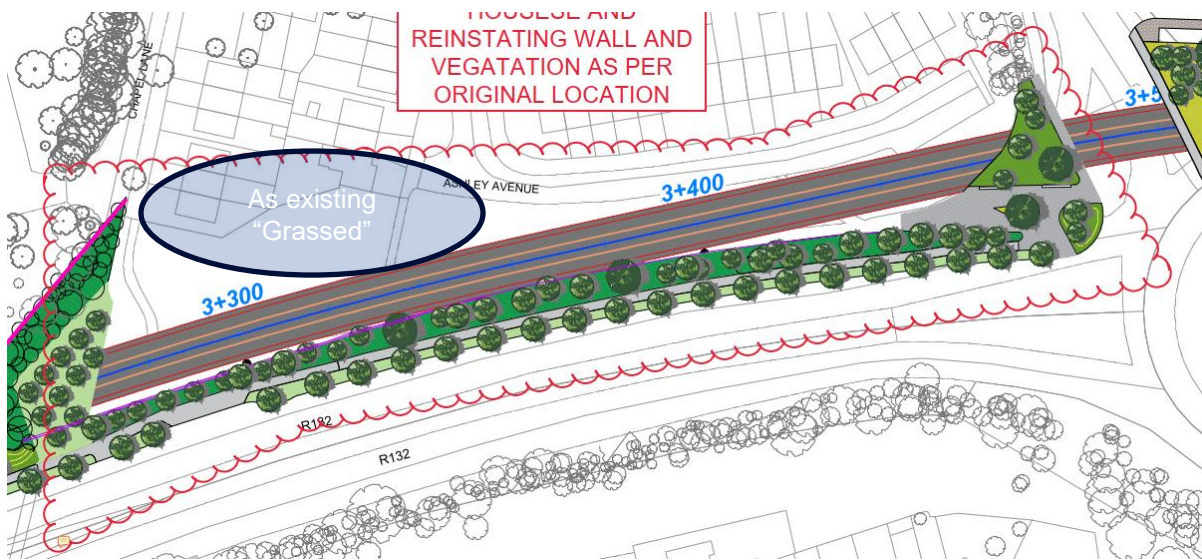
Amended Landscaping Proposals at Ashley Avenue if Boundary Wall and Landscaping is Reinstated as Existing
